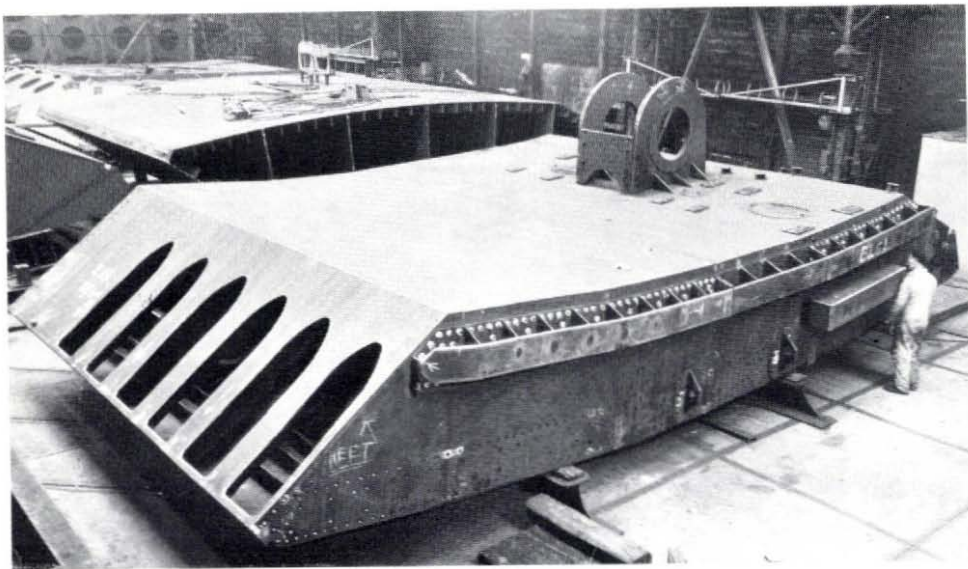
End section of gate in workshop (with eyes for suspension arm)
